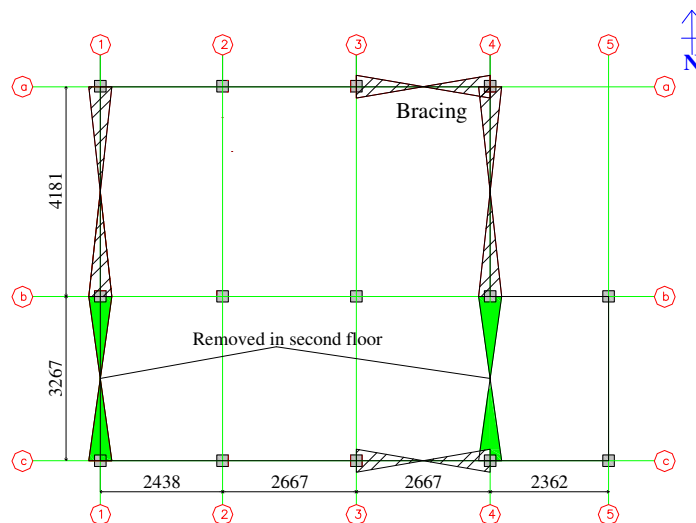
Bracing layout in the CCP1 building (all dimensions are in mm)
